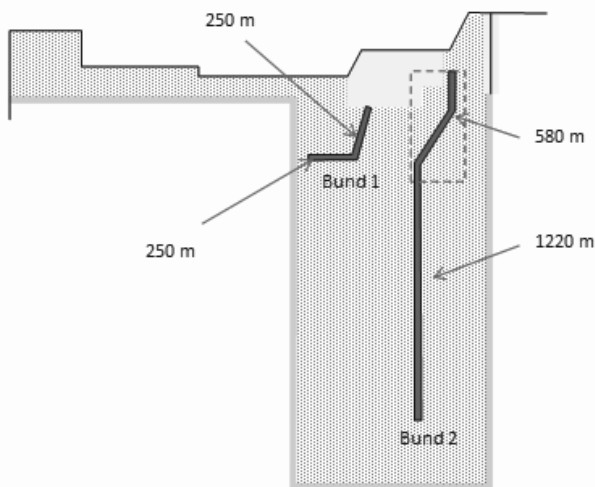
Length of geotextile containment bund 1 and 2 (Plan view)
